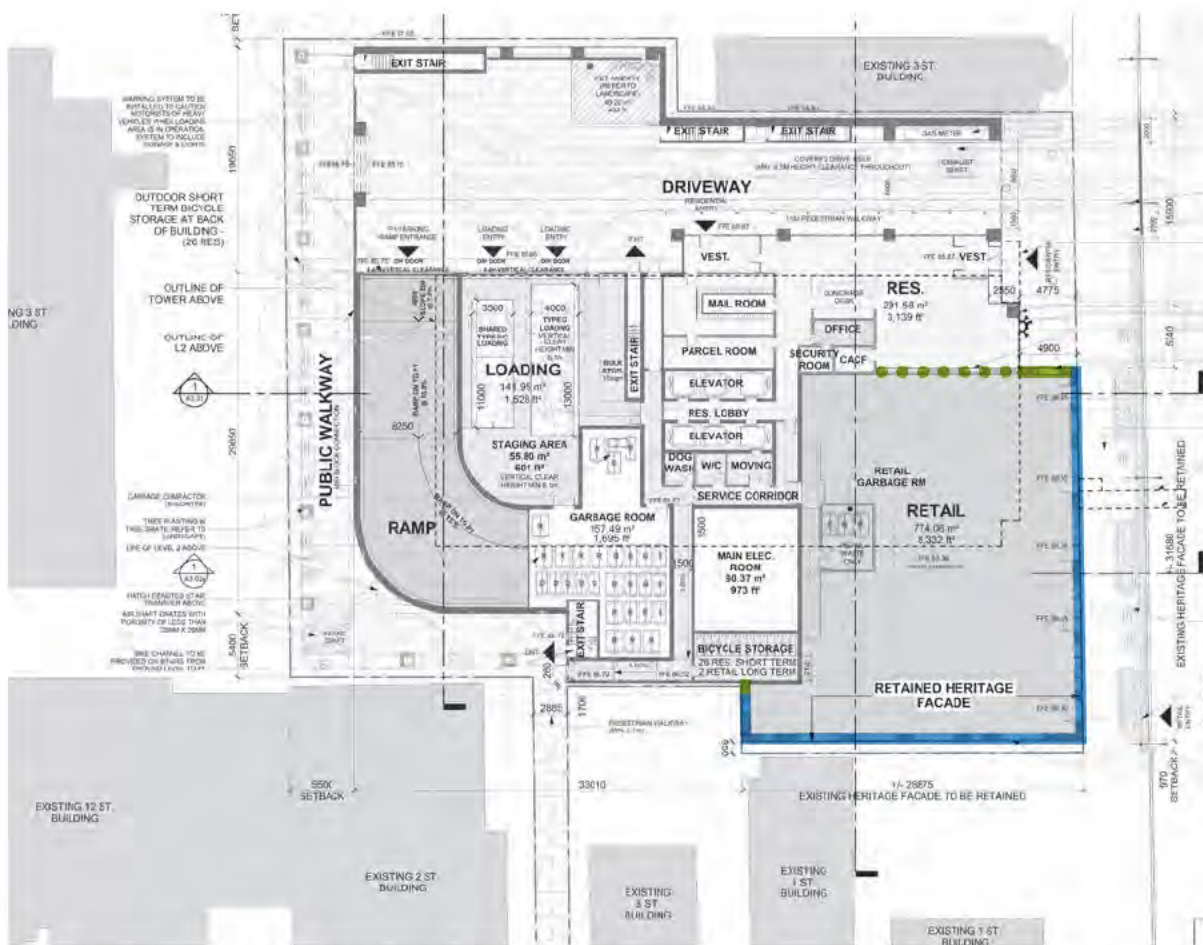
Proposed ground floor and site plan with retained and reconstructed facades highlighted (Wallman Architects, 2024; annotated by ERA).
